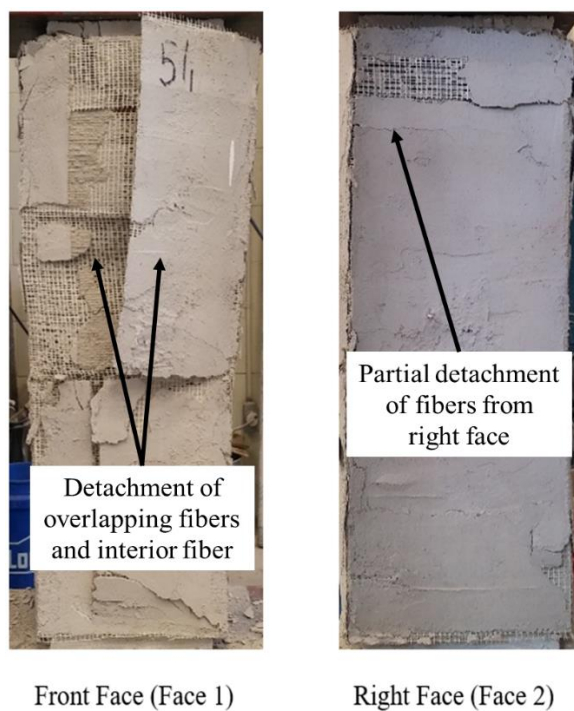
Specimen C-12-0-1-3 Damage After Testing: Front and Right Faces
